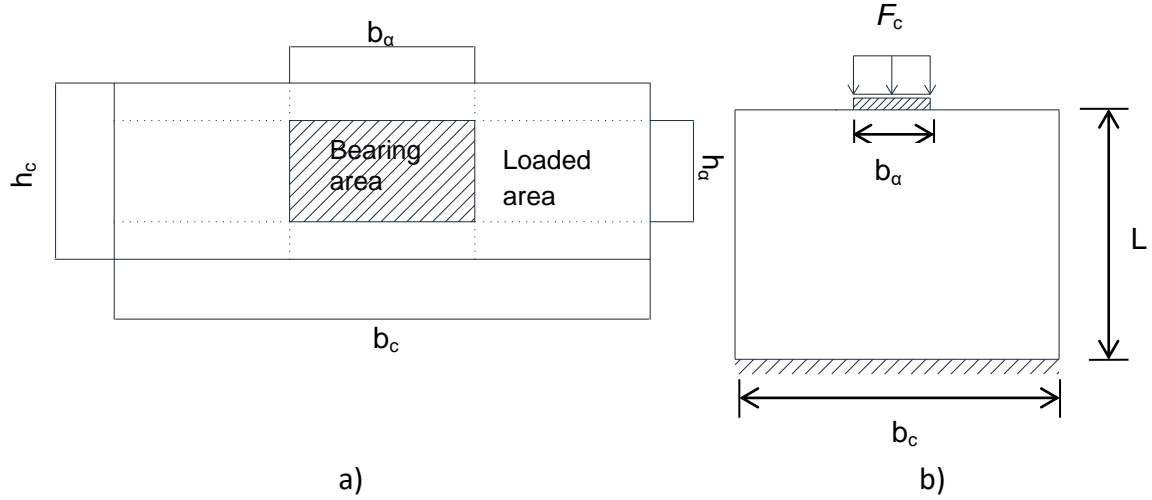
a) Plan; and b) side view of a concrete prism subjected to concentric rectangular surface load
